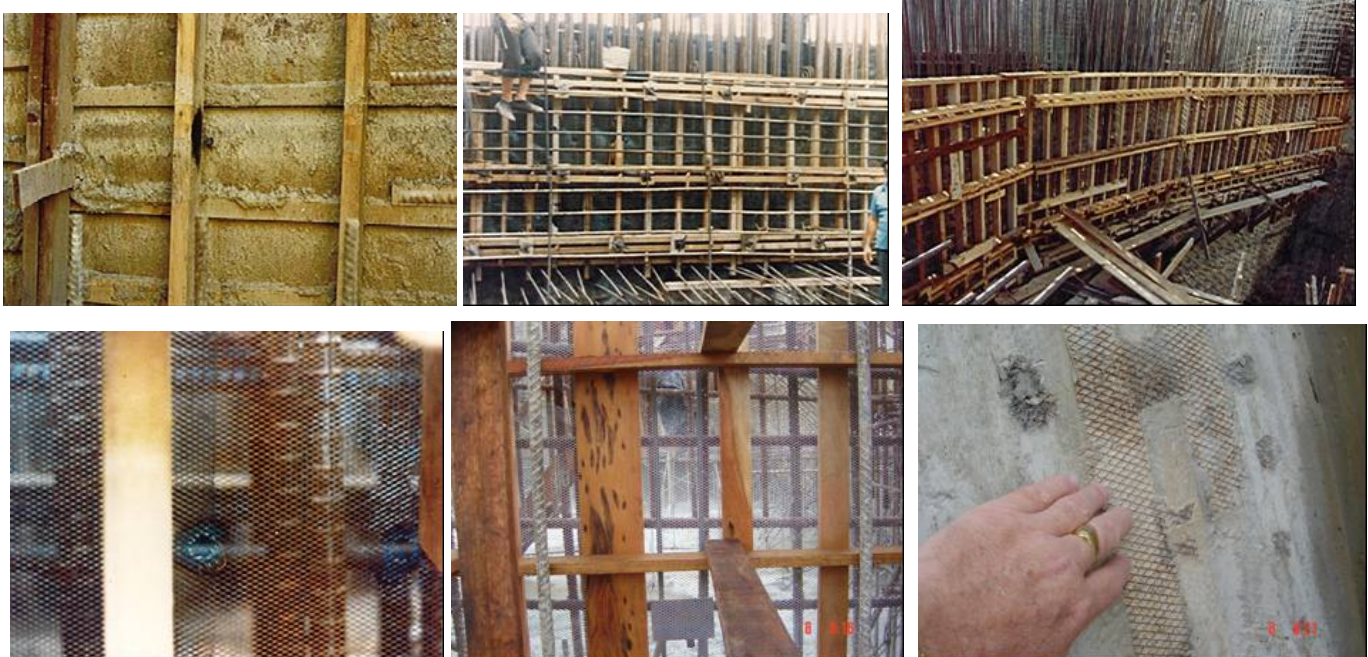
Expanded metal panel for mould between primary and secondary stages concretes
